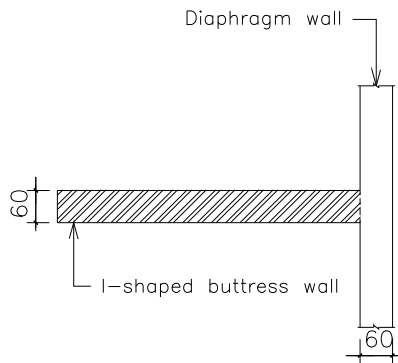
Details of I-shaped buttress wall (unit in cm)
